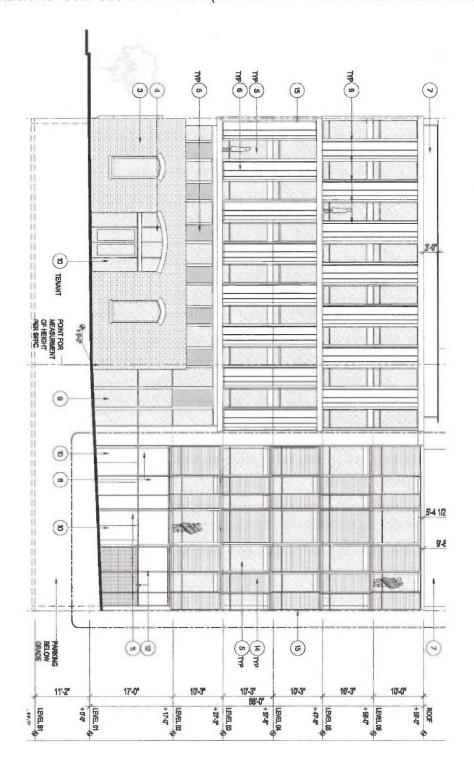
PROPOSED SOUTH ELEVATION (19TH STREET—PROJECT AND PROJECT VARIANT)
